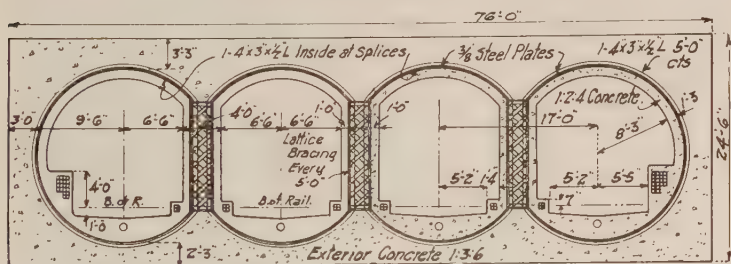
CROSS SECTION OF HARLEM RIVER TUNNEL OF THE NEW LEXINGTON AVENUE SUBWAY.
